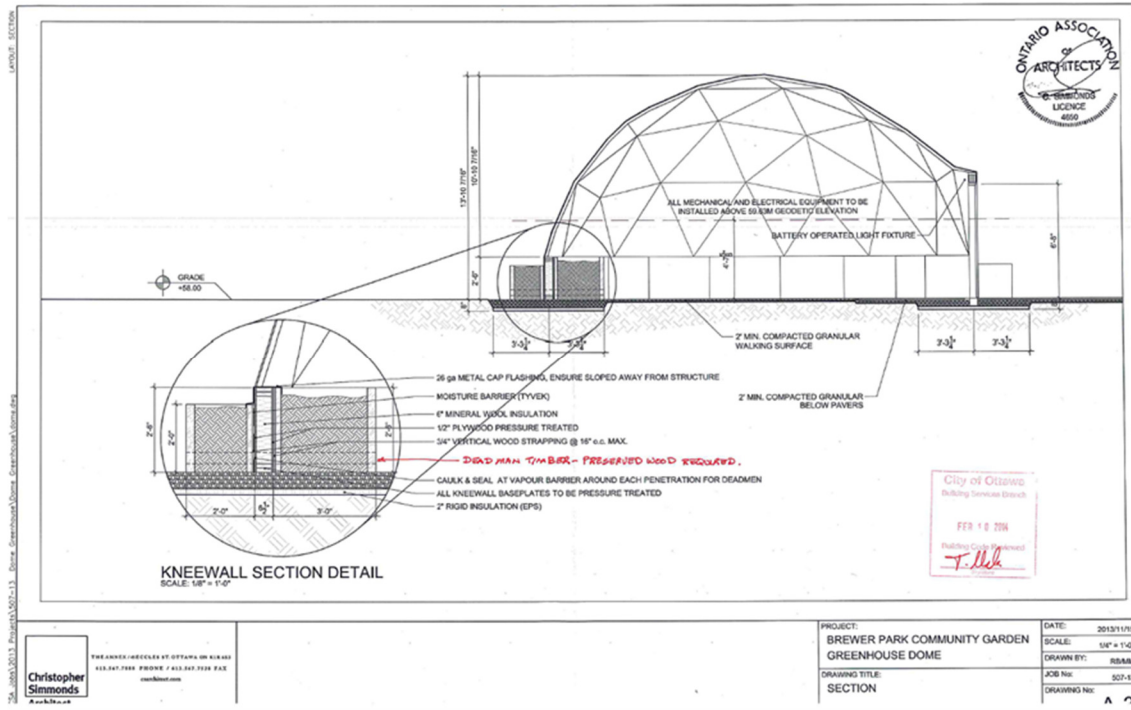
Architectural drawing of Biodome structure and wall detail (Christopher Simmonds Architect Inc., 2014). Adapted with permission.
